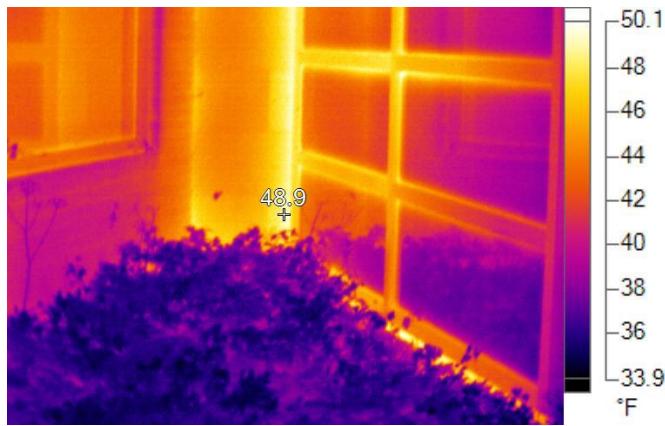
Infrared Image of heat loss through the connection between the new and old sections of the building.
